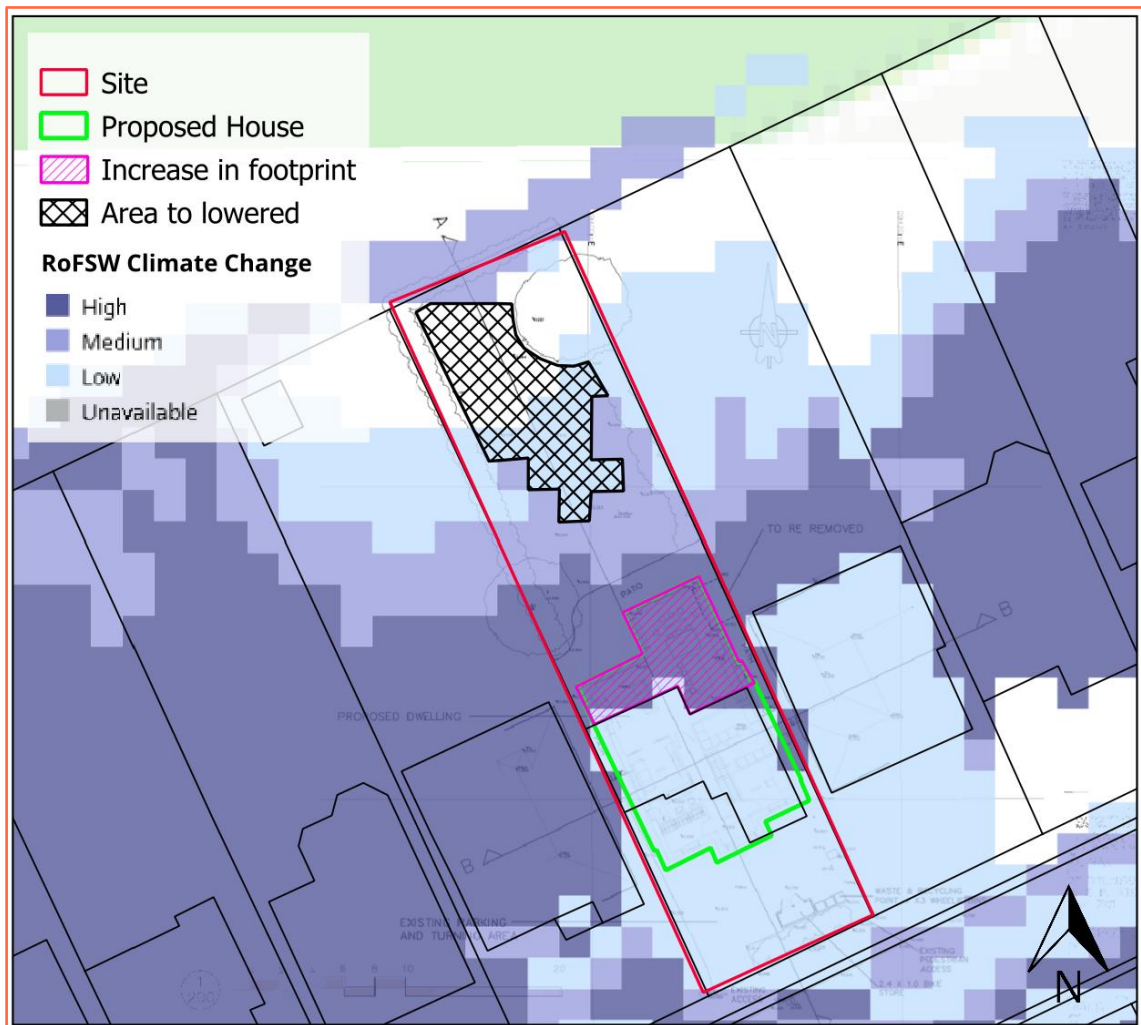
Proposed site plan showing proposed area of land to be lowered by 0.15m, to provide compensatory flood storage with RoFSW Climate Change extents overlain
